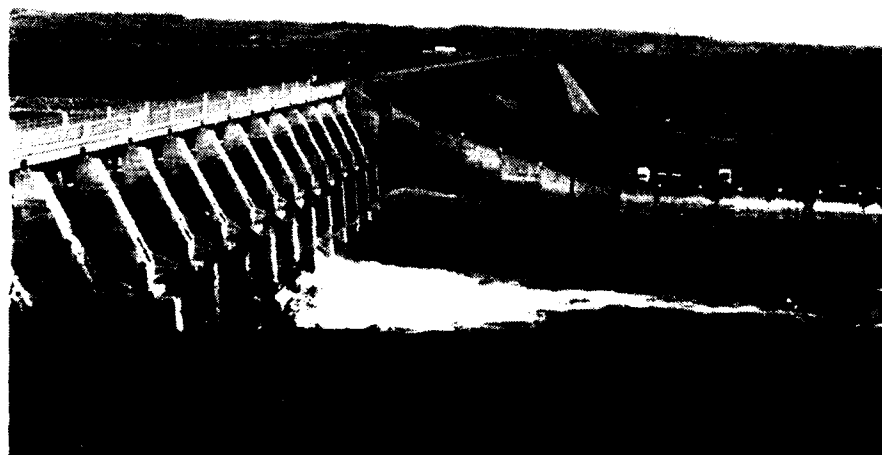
Spillway and embankment, looking north. May 1979.
